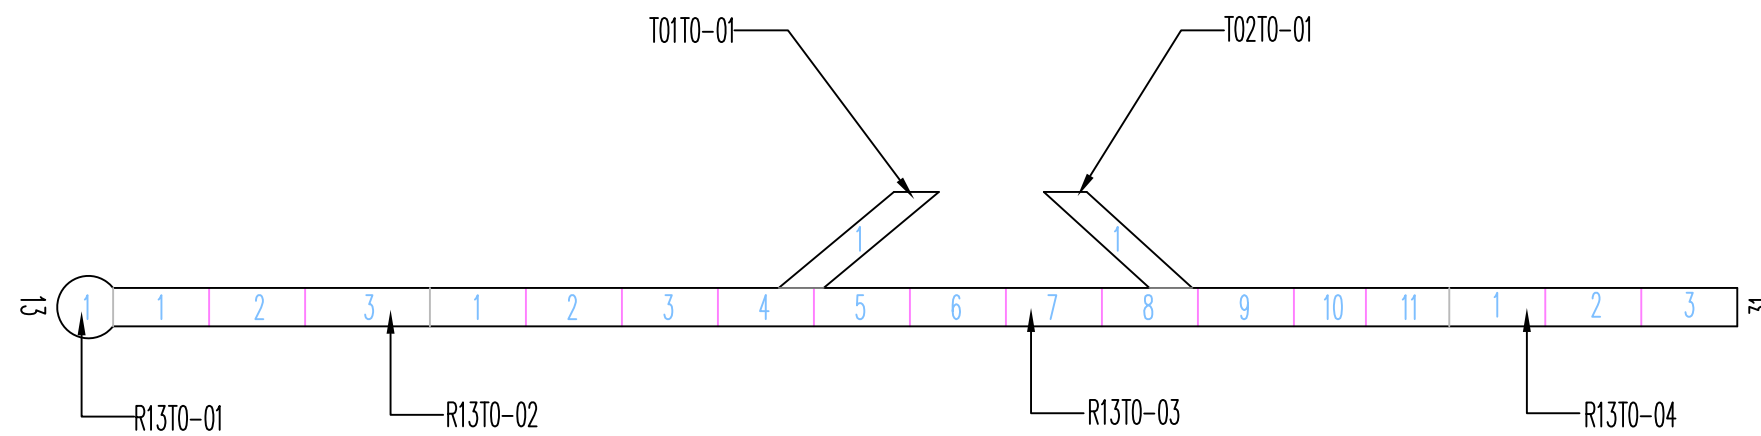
Pavement Branch, Section and Sample Unit Layout.
